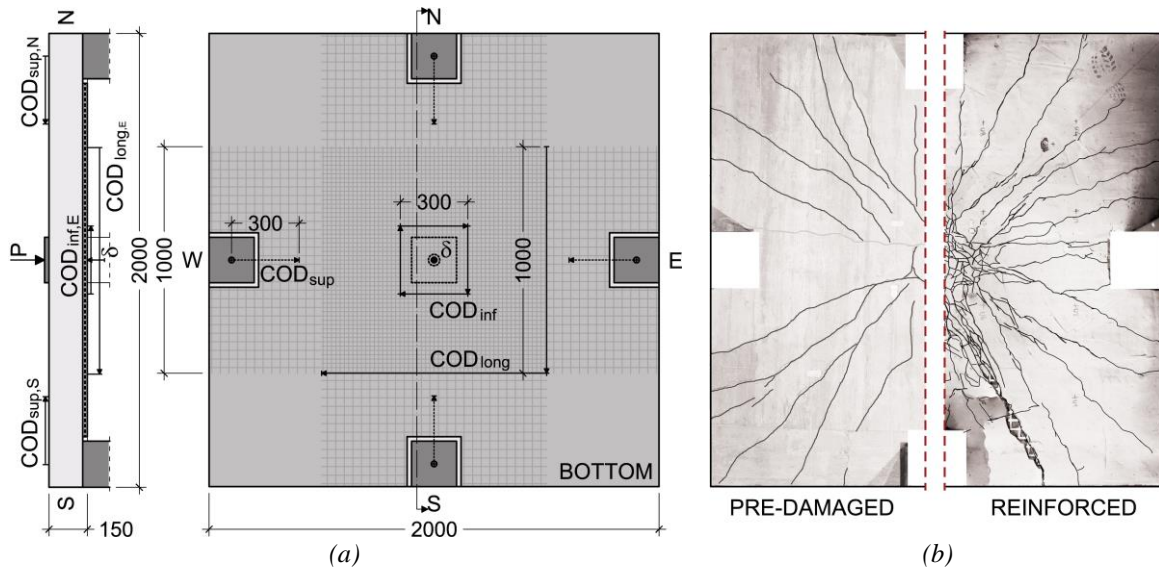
Slab tests scheme and instruments disposition (a). Crack pattern at the intrados surface of the SF2 slab (b). [Dimensions are in mm].
